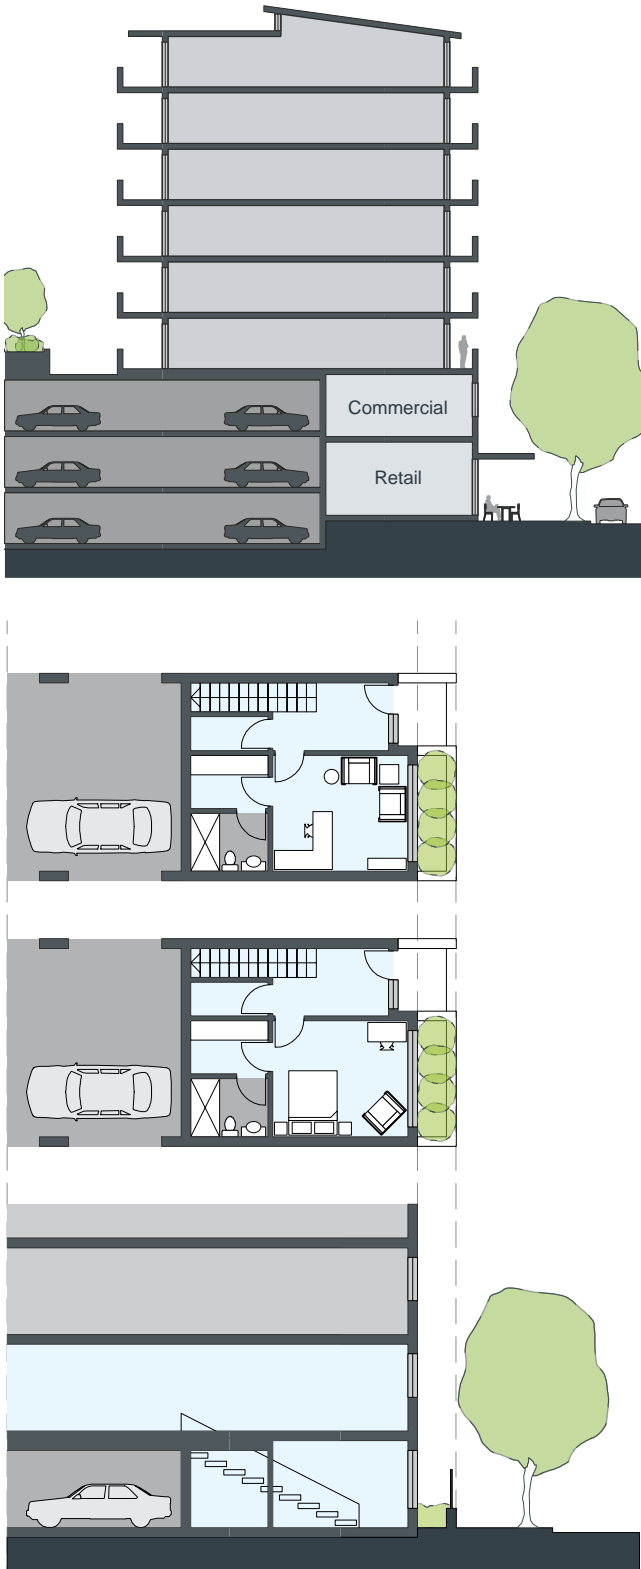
J.17 Above ground parking should be concealed behind the building facade and wrapped with other uses along the primary street frontage, such as retail, commercial or two storey SOHO units
